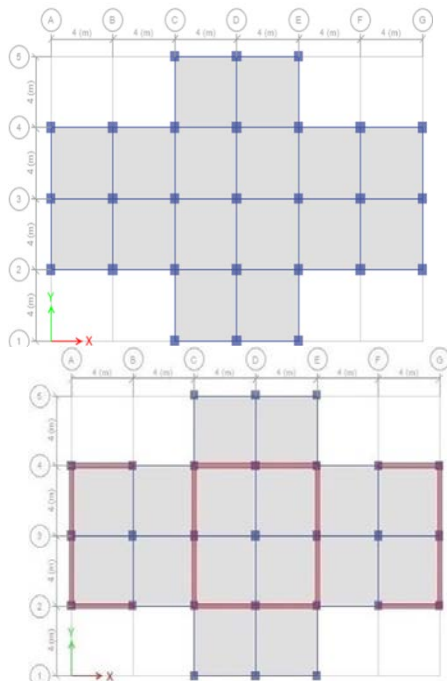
Plan of irregular structure P1 representing bare frame and frame with bracings and infill walls
